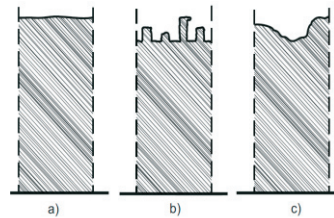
The division of walls with respect to the crest shape: a) a wall with a leveled crest, b) a wall of a volumetric object window openings, c) a wall with an irregular line of the crest
